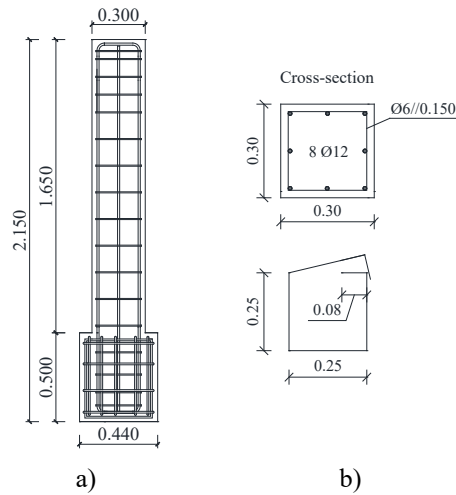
Geometry and reinforcement detailing: a) global dimensions; b) cross-section (dimensions in m).
